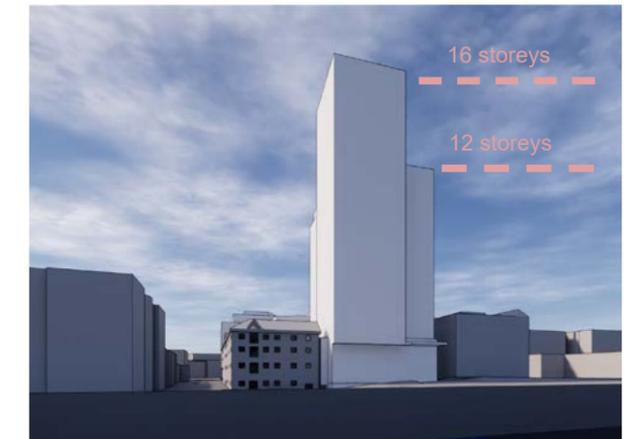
View A from North side of river towards 16 storey building to Bank Place
